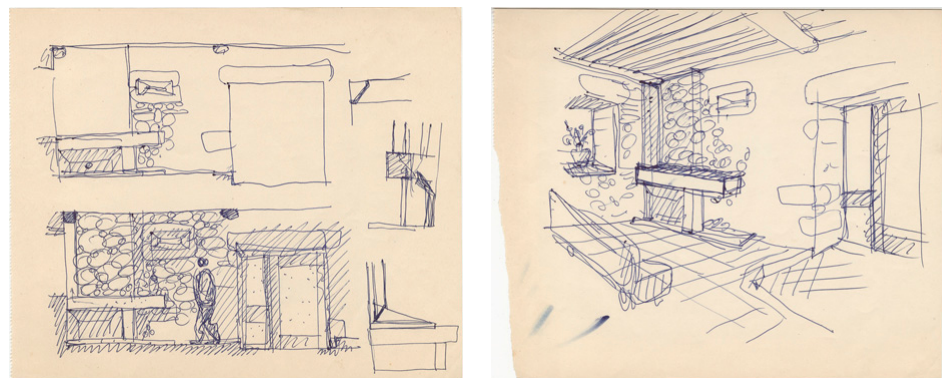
Fernando Távora. Além House (1956). Sketches for a new fireplace on the ground floor: elevation and perspective (source: Marques da Silva Foundation, Fernando Távora Archive: PT/FIMS/FT/0065-pd0001, PT/FIMS/FT/0065-pd0002).
